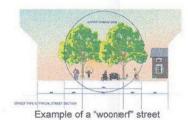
Generic Street Sections [Capital Consortium Part 2, P60]
